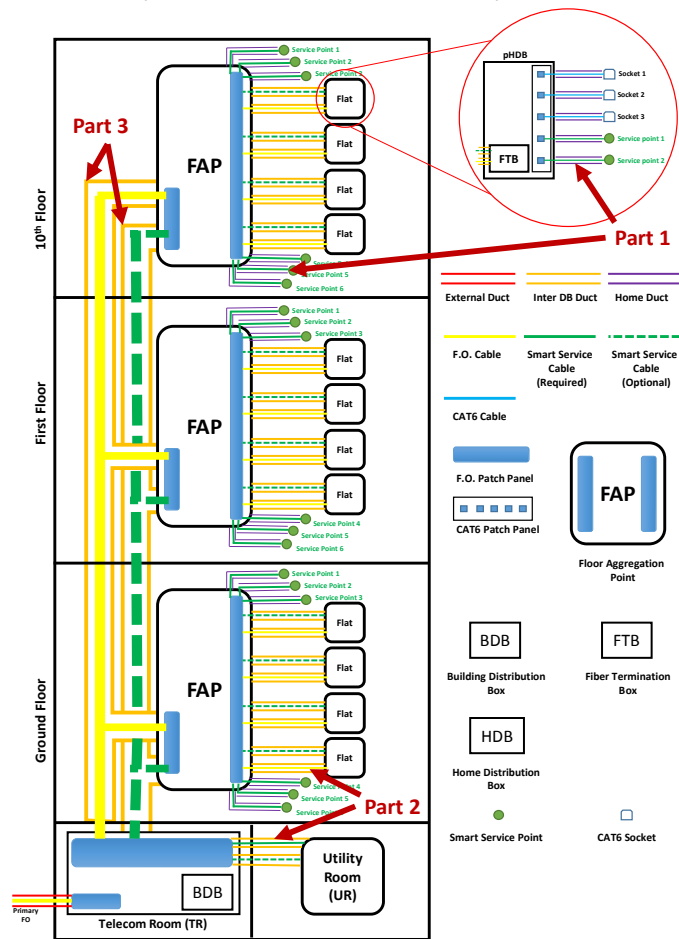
Example 1: Ten Floor Multi Dwelling Building Illustration
